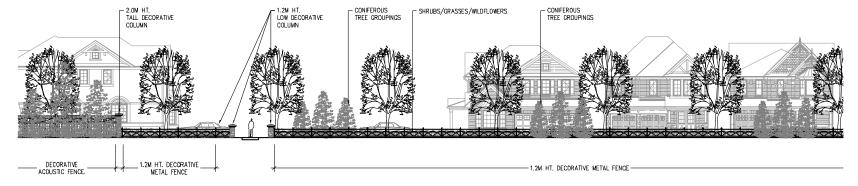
Williams Parkway - Window Street / Flankage Lot Treatment - Concept Elevation
